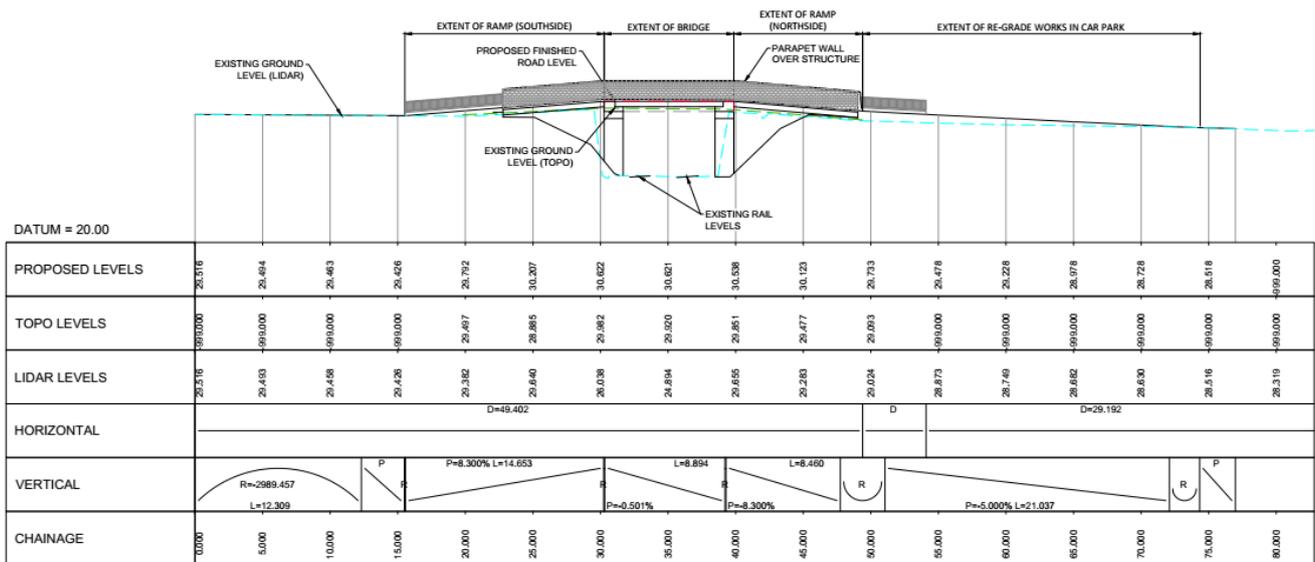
Glasnevin Cemetery Access Road - Profile
